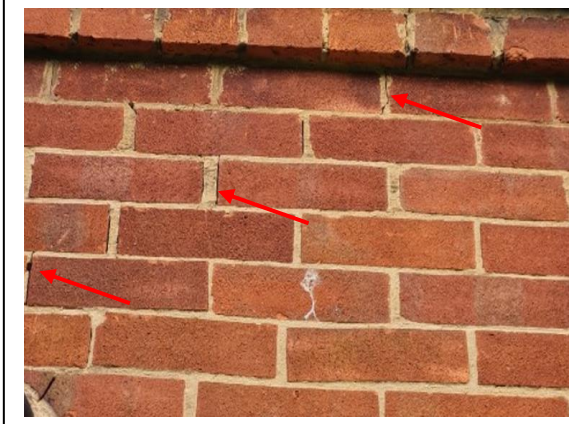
Rear Elevation – Cracking below First Floor Left Window
